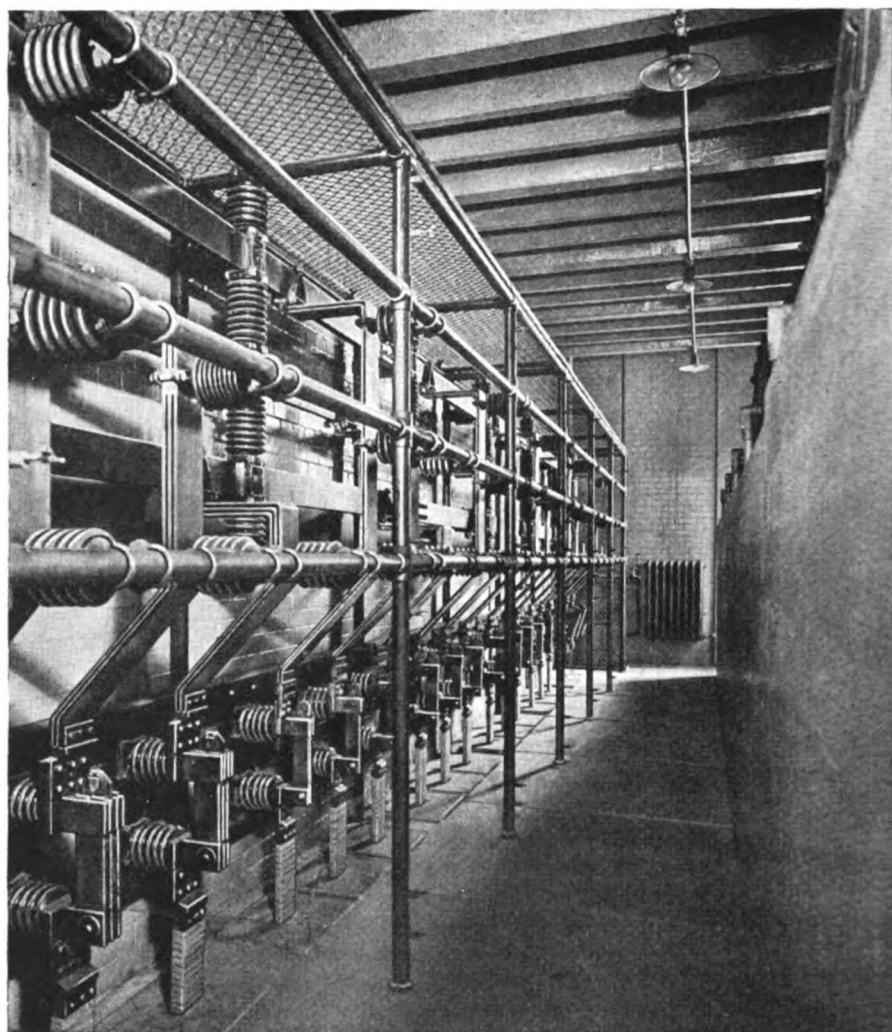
This view shows a typical industrial plant installation with standardized unit-type bus supports and disconnecting switches
